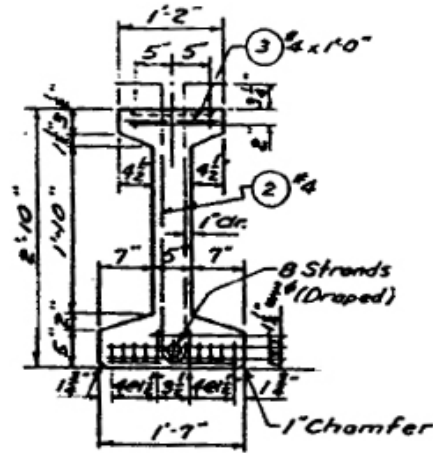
Bridge 5/227 50 ft. Series Girder
